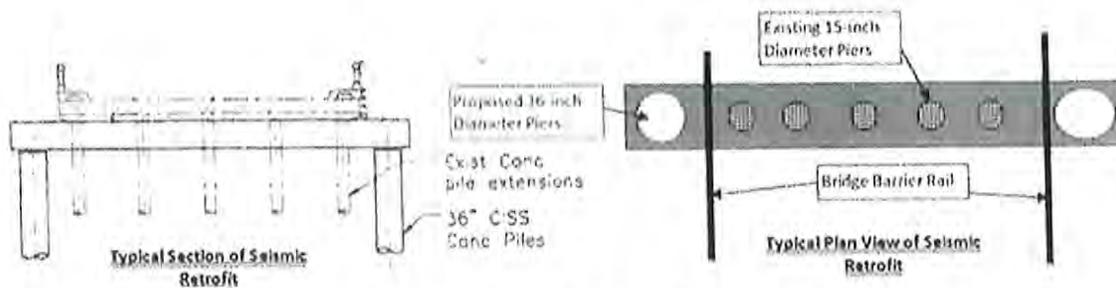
Marsh Drive Bridge Proposed Seismic Retrofit Pier Bent Cross Section and Plan View
